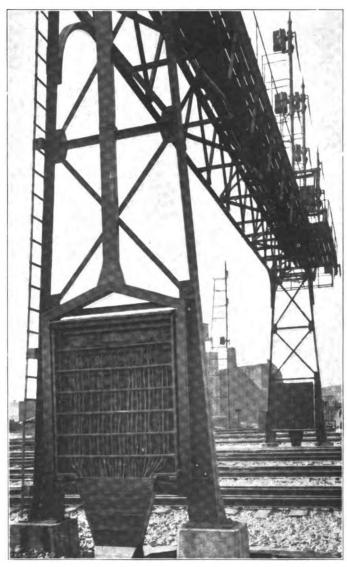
Rear of Relay Box with Back Removed, Showing Arrangement of Wires and Cables.
